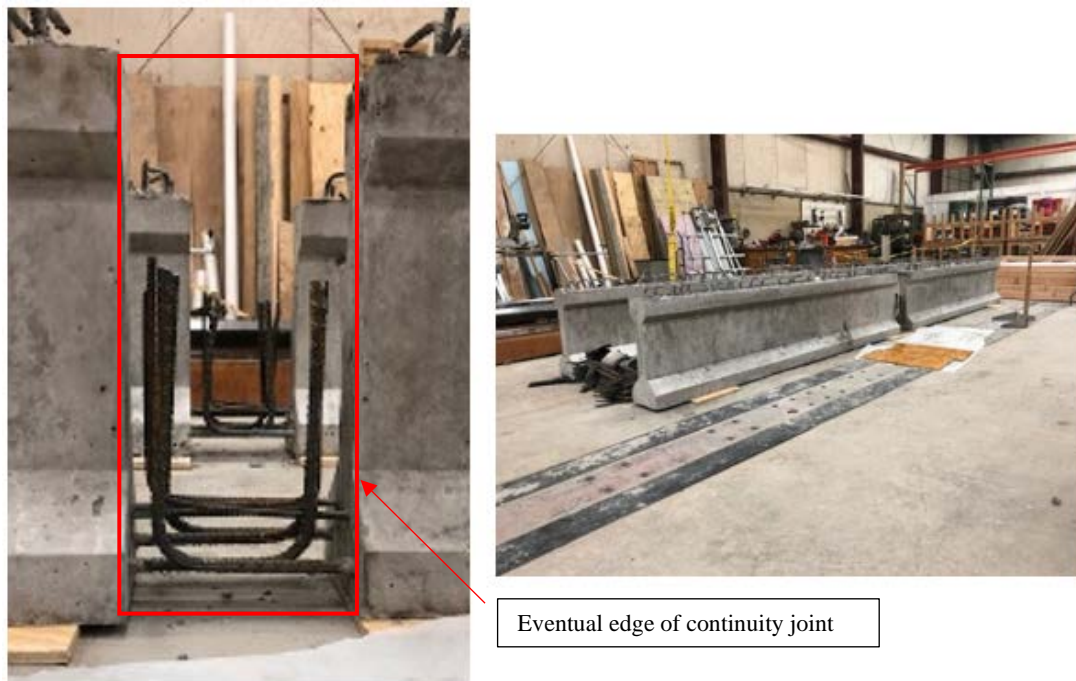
Orientation of Half-Length Girders Prior to Deck/Joint Casting
